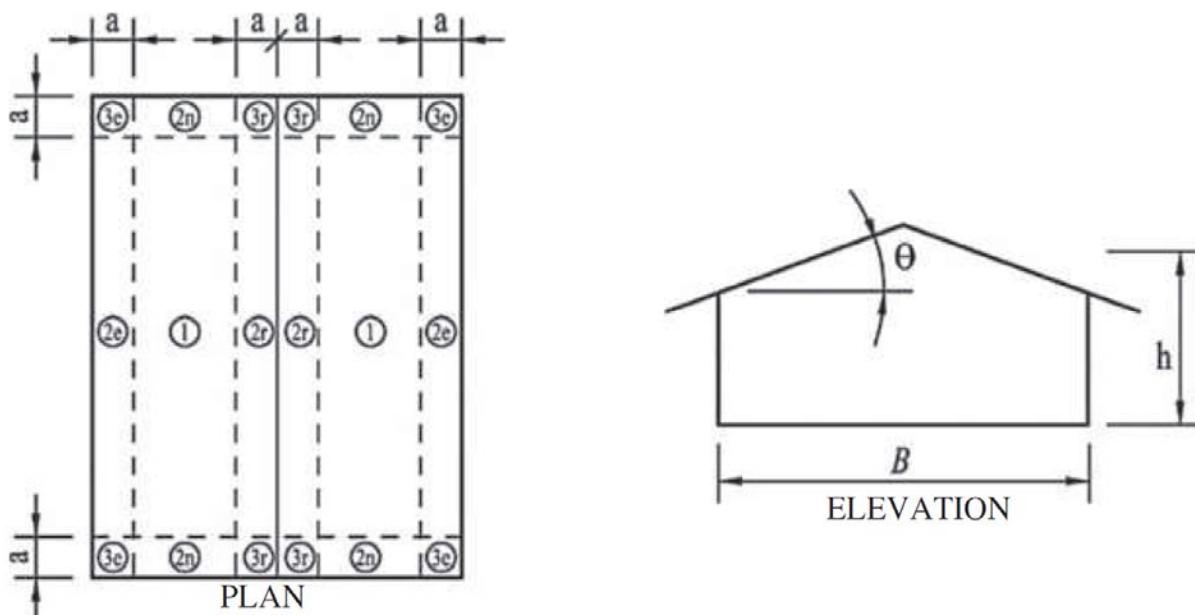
Roof Zones for Gable Roof Slopes Between 7 and 45 degrees
